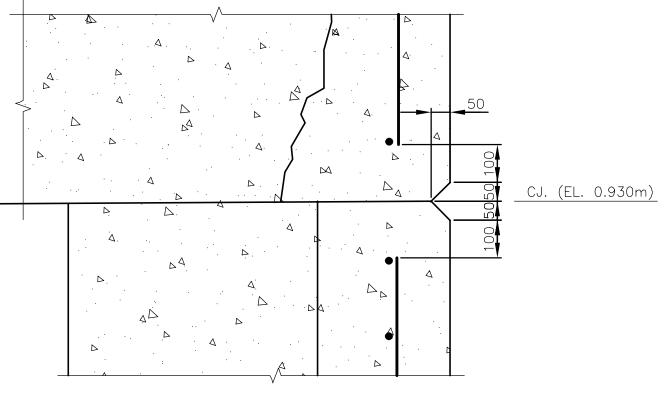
DETAIL - TRANSITION FROM GRAVITY \WALL TO CONCRETE CRIB
